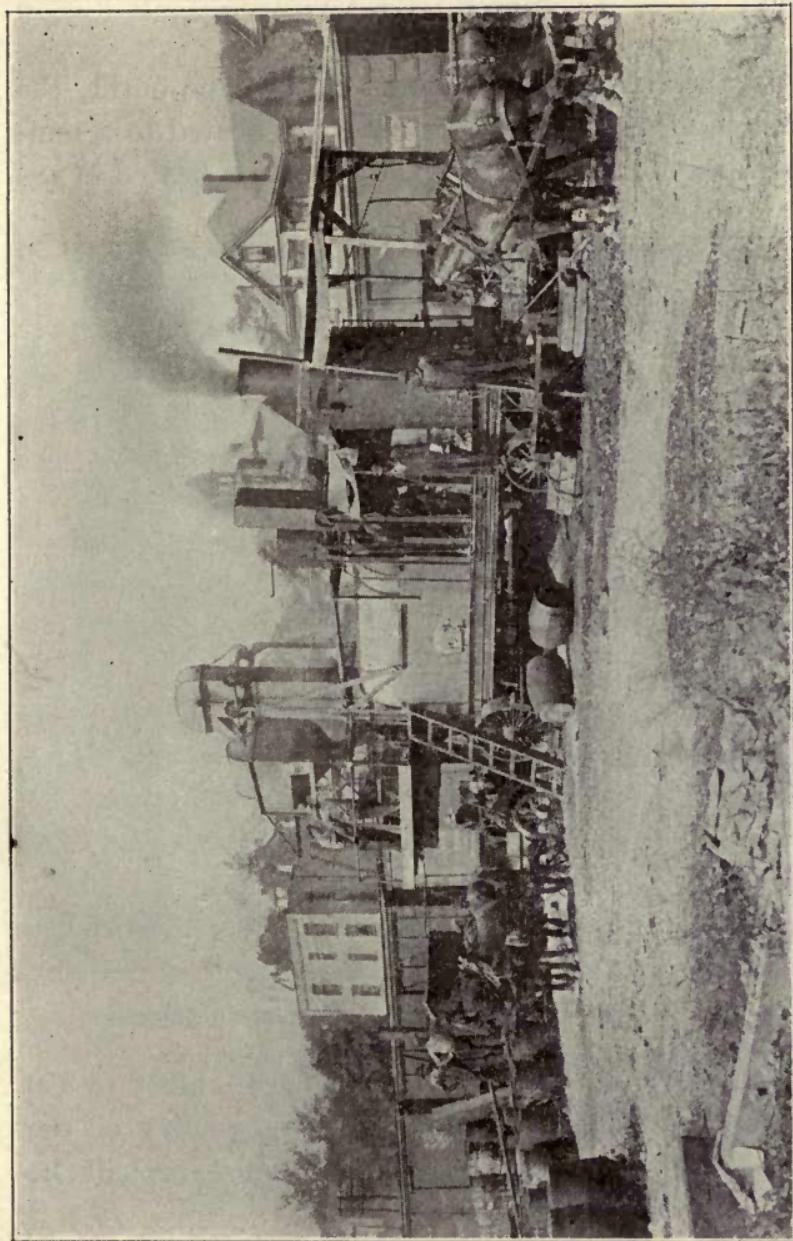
Portable plant for mixing asphaltic concrete. (Built by Iroquois Iron Works, Buffalo, N. Y.)
